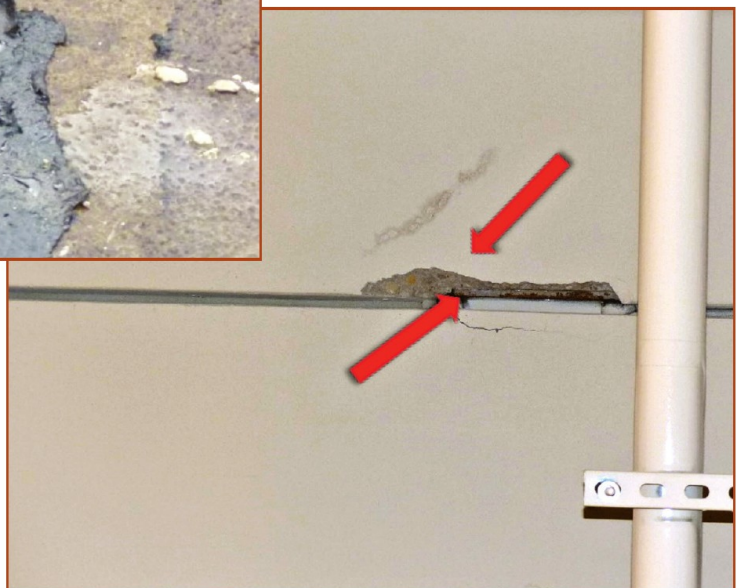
Cracked and delaminated concrete on the underside of a precast concrete double tee.
